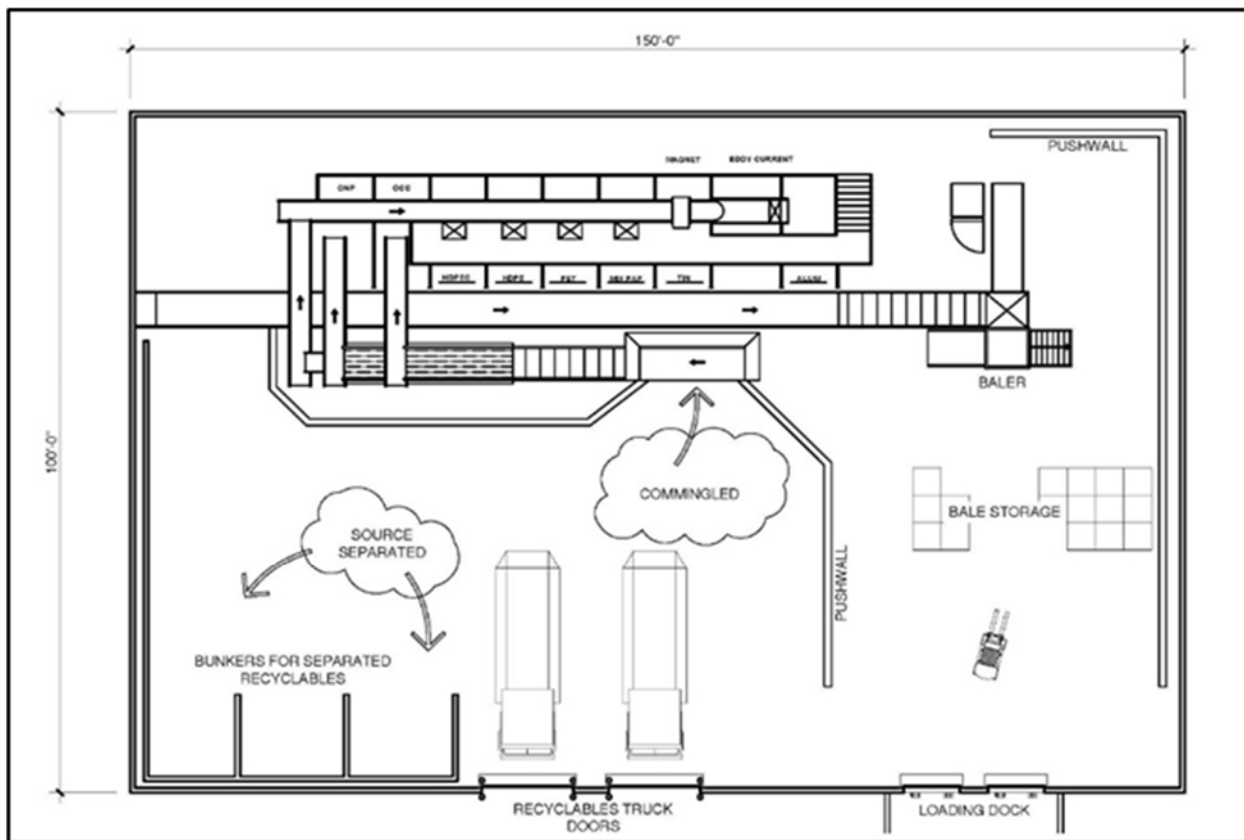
Basic MRF Building Layout Plan (courtesy of Bell & Associates)
